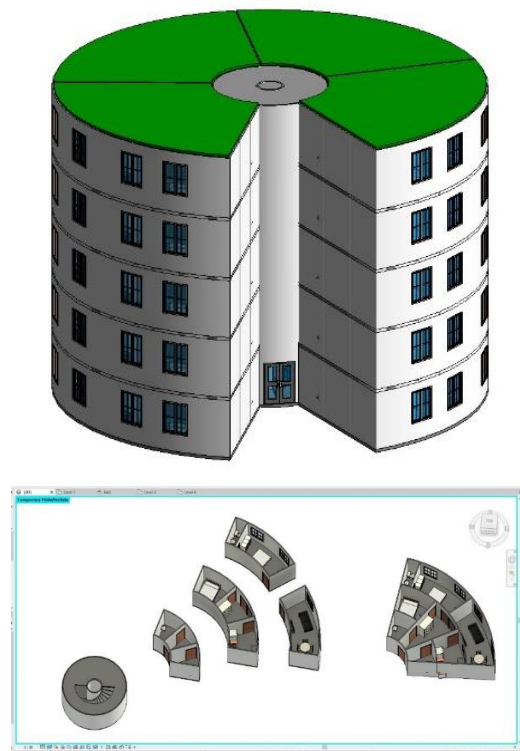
Building perspective view, stair module, 4 types of room modules and a apartments formed by these
